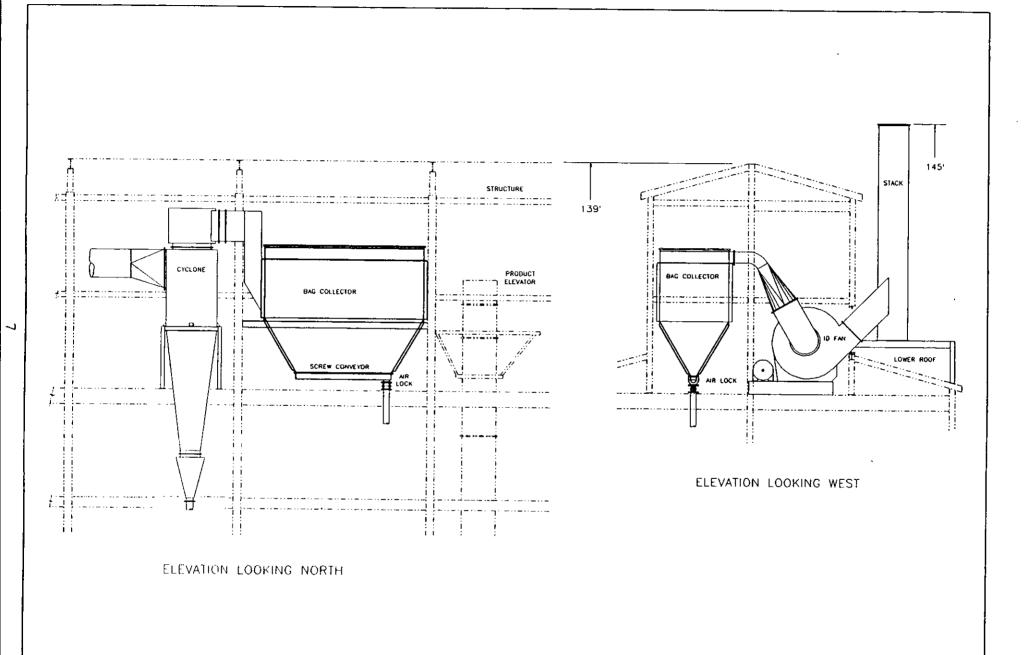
BAG COLLECTOR ELEVATION VIEWS
